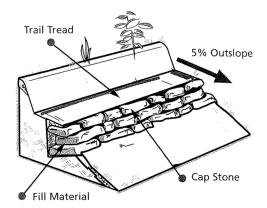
Side view of a wall illustrating the different elements if the structure. This wall and the hillslope have been drawn at an exaggerated angle to help illustrate the concept of batter (run over rise). The batter here is almost 1:1 but it would actually be about 1:4 for most walls. (IMAGE COURTESY OF VOC)
